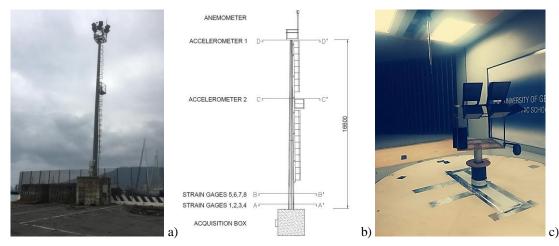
The light tower (a); location of sensors and acquisition unit (b); tower top model in the wind tunnel (c).
